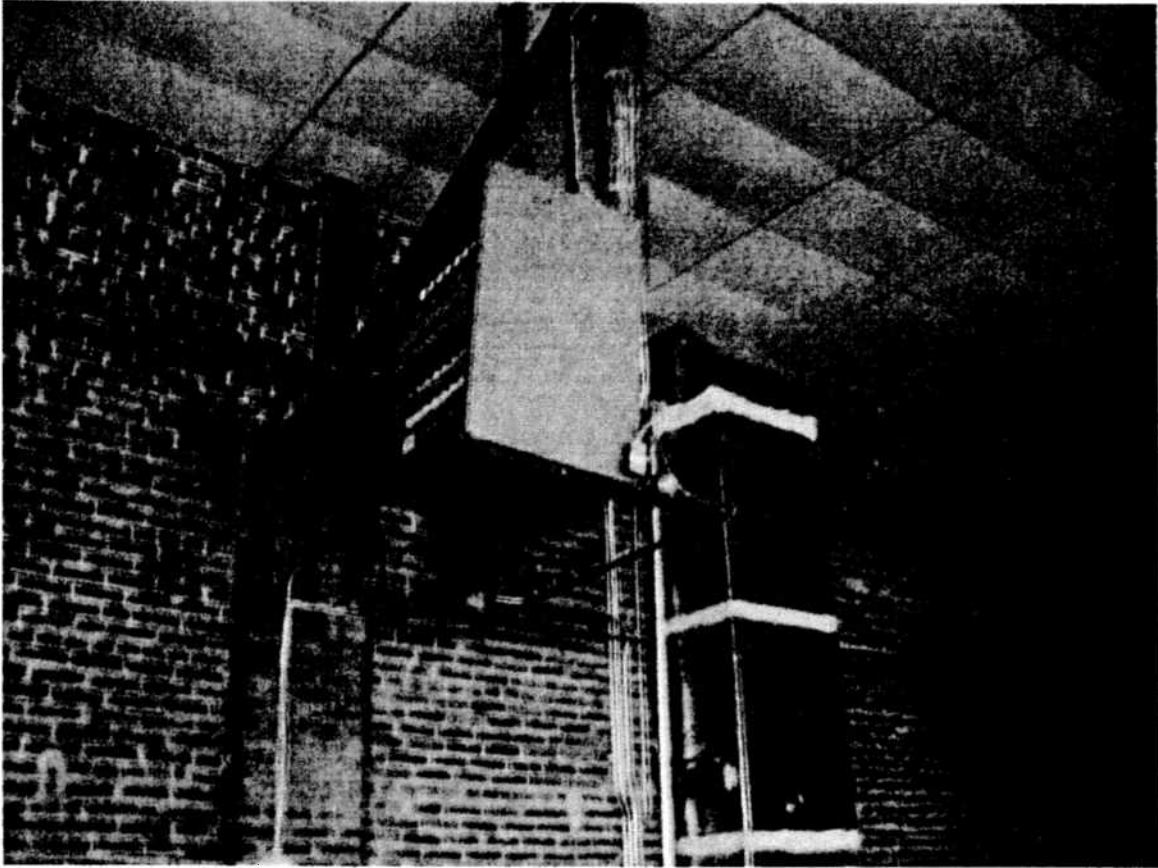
Healdton Armory – space heater in the gymnasium (drill floor) area near the north wall.
